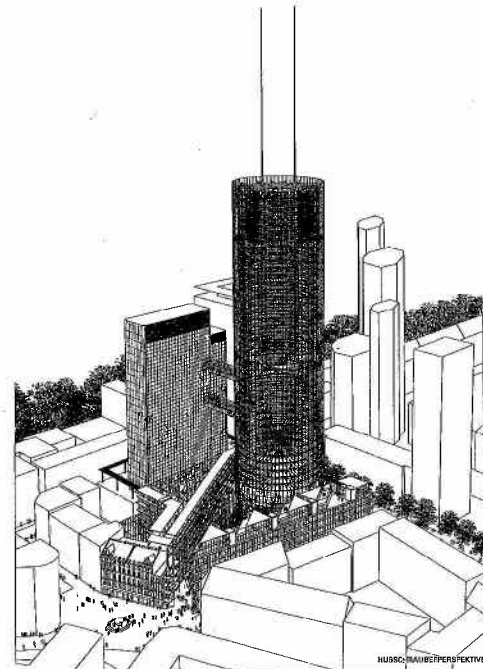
(b) Bird's eye view of new tower block adjacent to existing bank building
